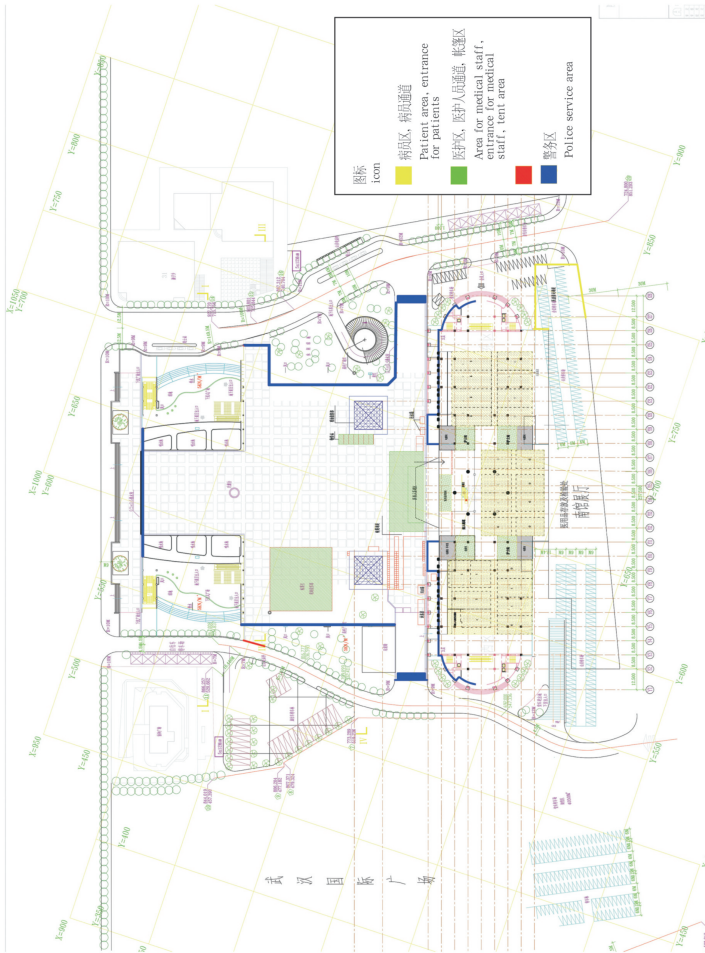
Plan of Zall (Jiangnan Wuzhan) Fangcang Shelter Hospital Floor 1
